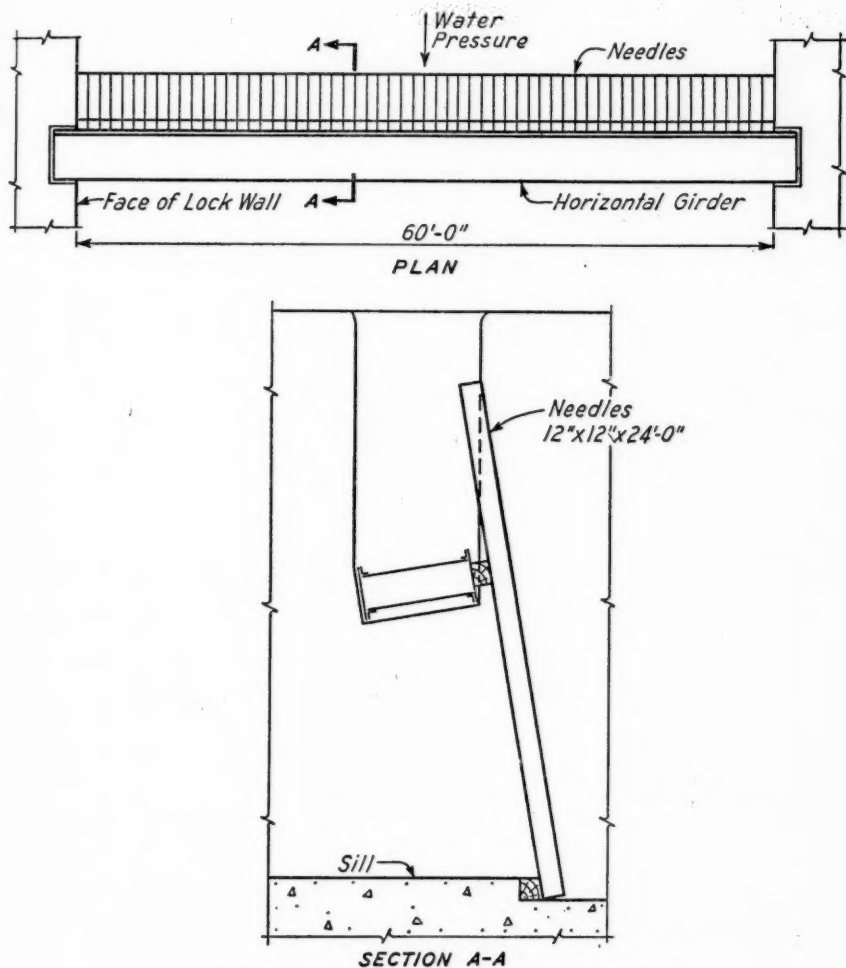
UNWATERING A DAM OF THE GIRDER AND NEEDLE TYPE, BASED ON THE INSTALLATION AT WHEELER DAM ON THE TENNESSEE RIVER
